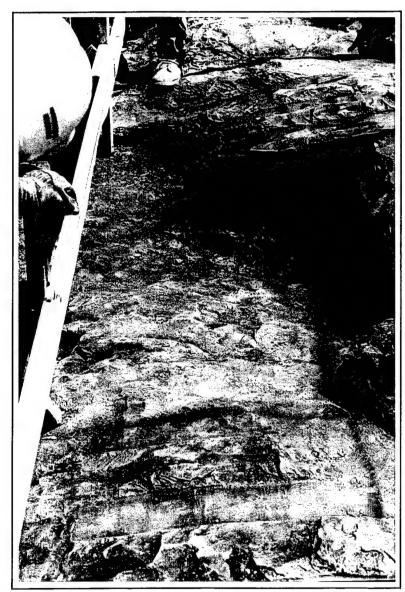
Station 415+88 to 415+90, 40 to 50 feet right of centerline showing the blocky, non-fissionable structure of the claystone.
